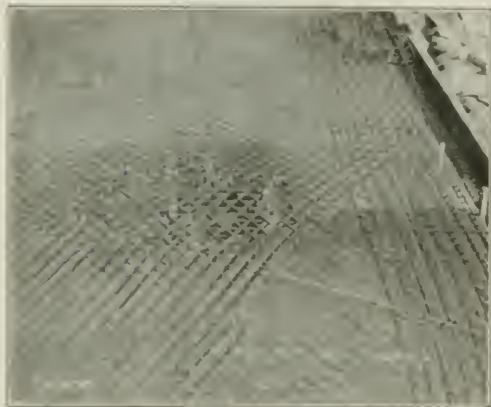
VIEW OF REINFORCEMENT OF MORROW FLOOR, READY FOR CONCRETING
